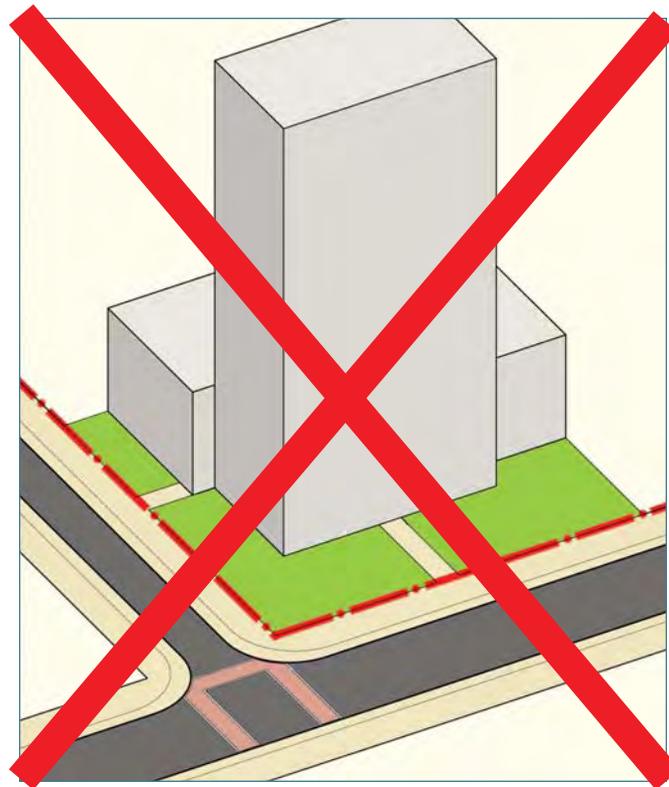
Excessive and inconsistent building setbacks create a poorly-defined street corridor
